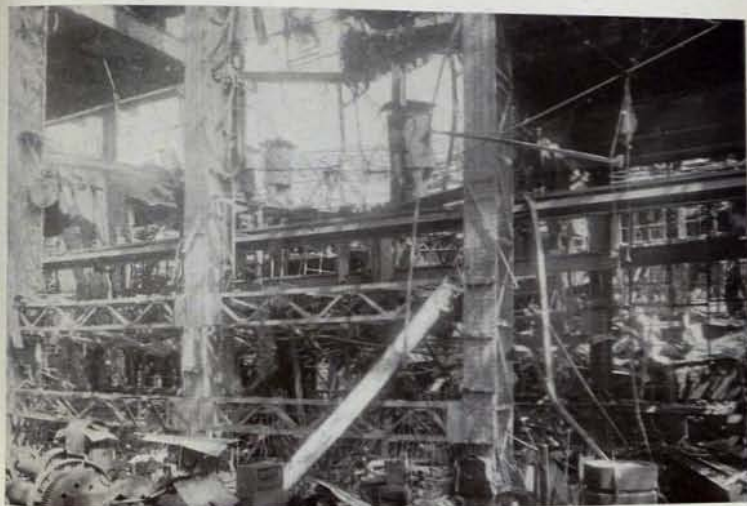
Group 52, Building 12. Jap photo dated 7 August 1945. High-explosive damage to multistory section of machine shop (Section 12h5).
